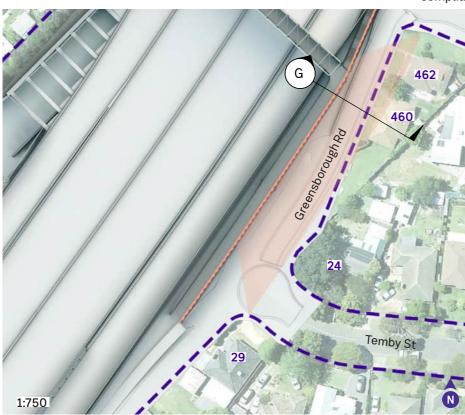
Focus Analysis: Nell Street Shared Use Path Bridge - Eastern Ramp Overlooking Analysis Plan - throw screen Type A or B application (no overlooking mitigation)
